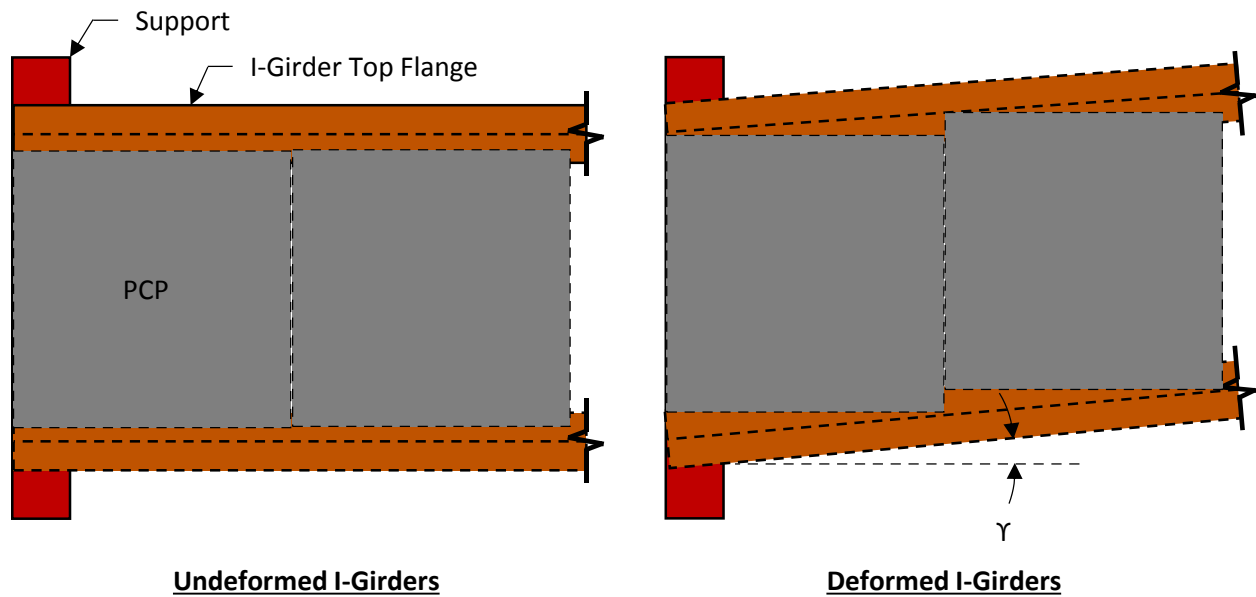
I-Girder Deformation near the Supports – Plan View
